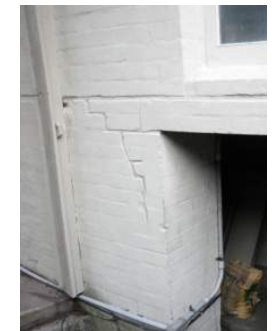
Detail Picture of the Crawl Space Entry on the Carondelet Street Elevation Near the Crawl Space. Photo by Matthew Cerick. 2015
